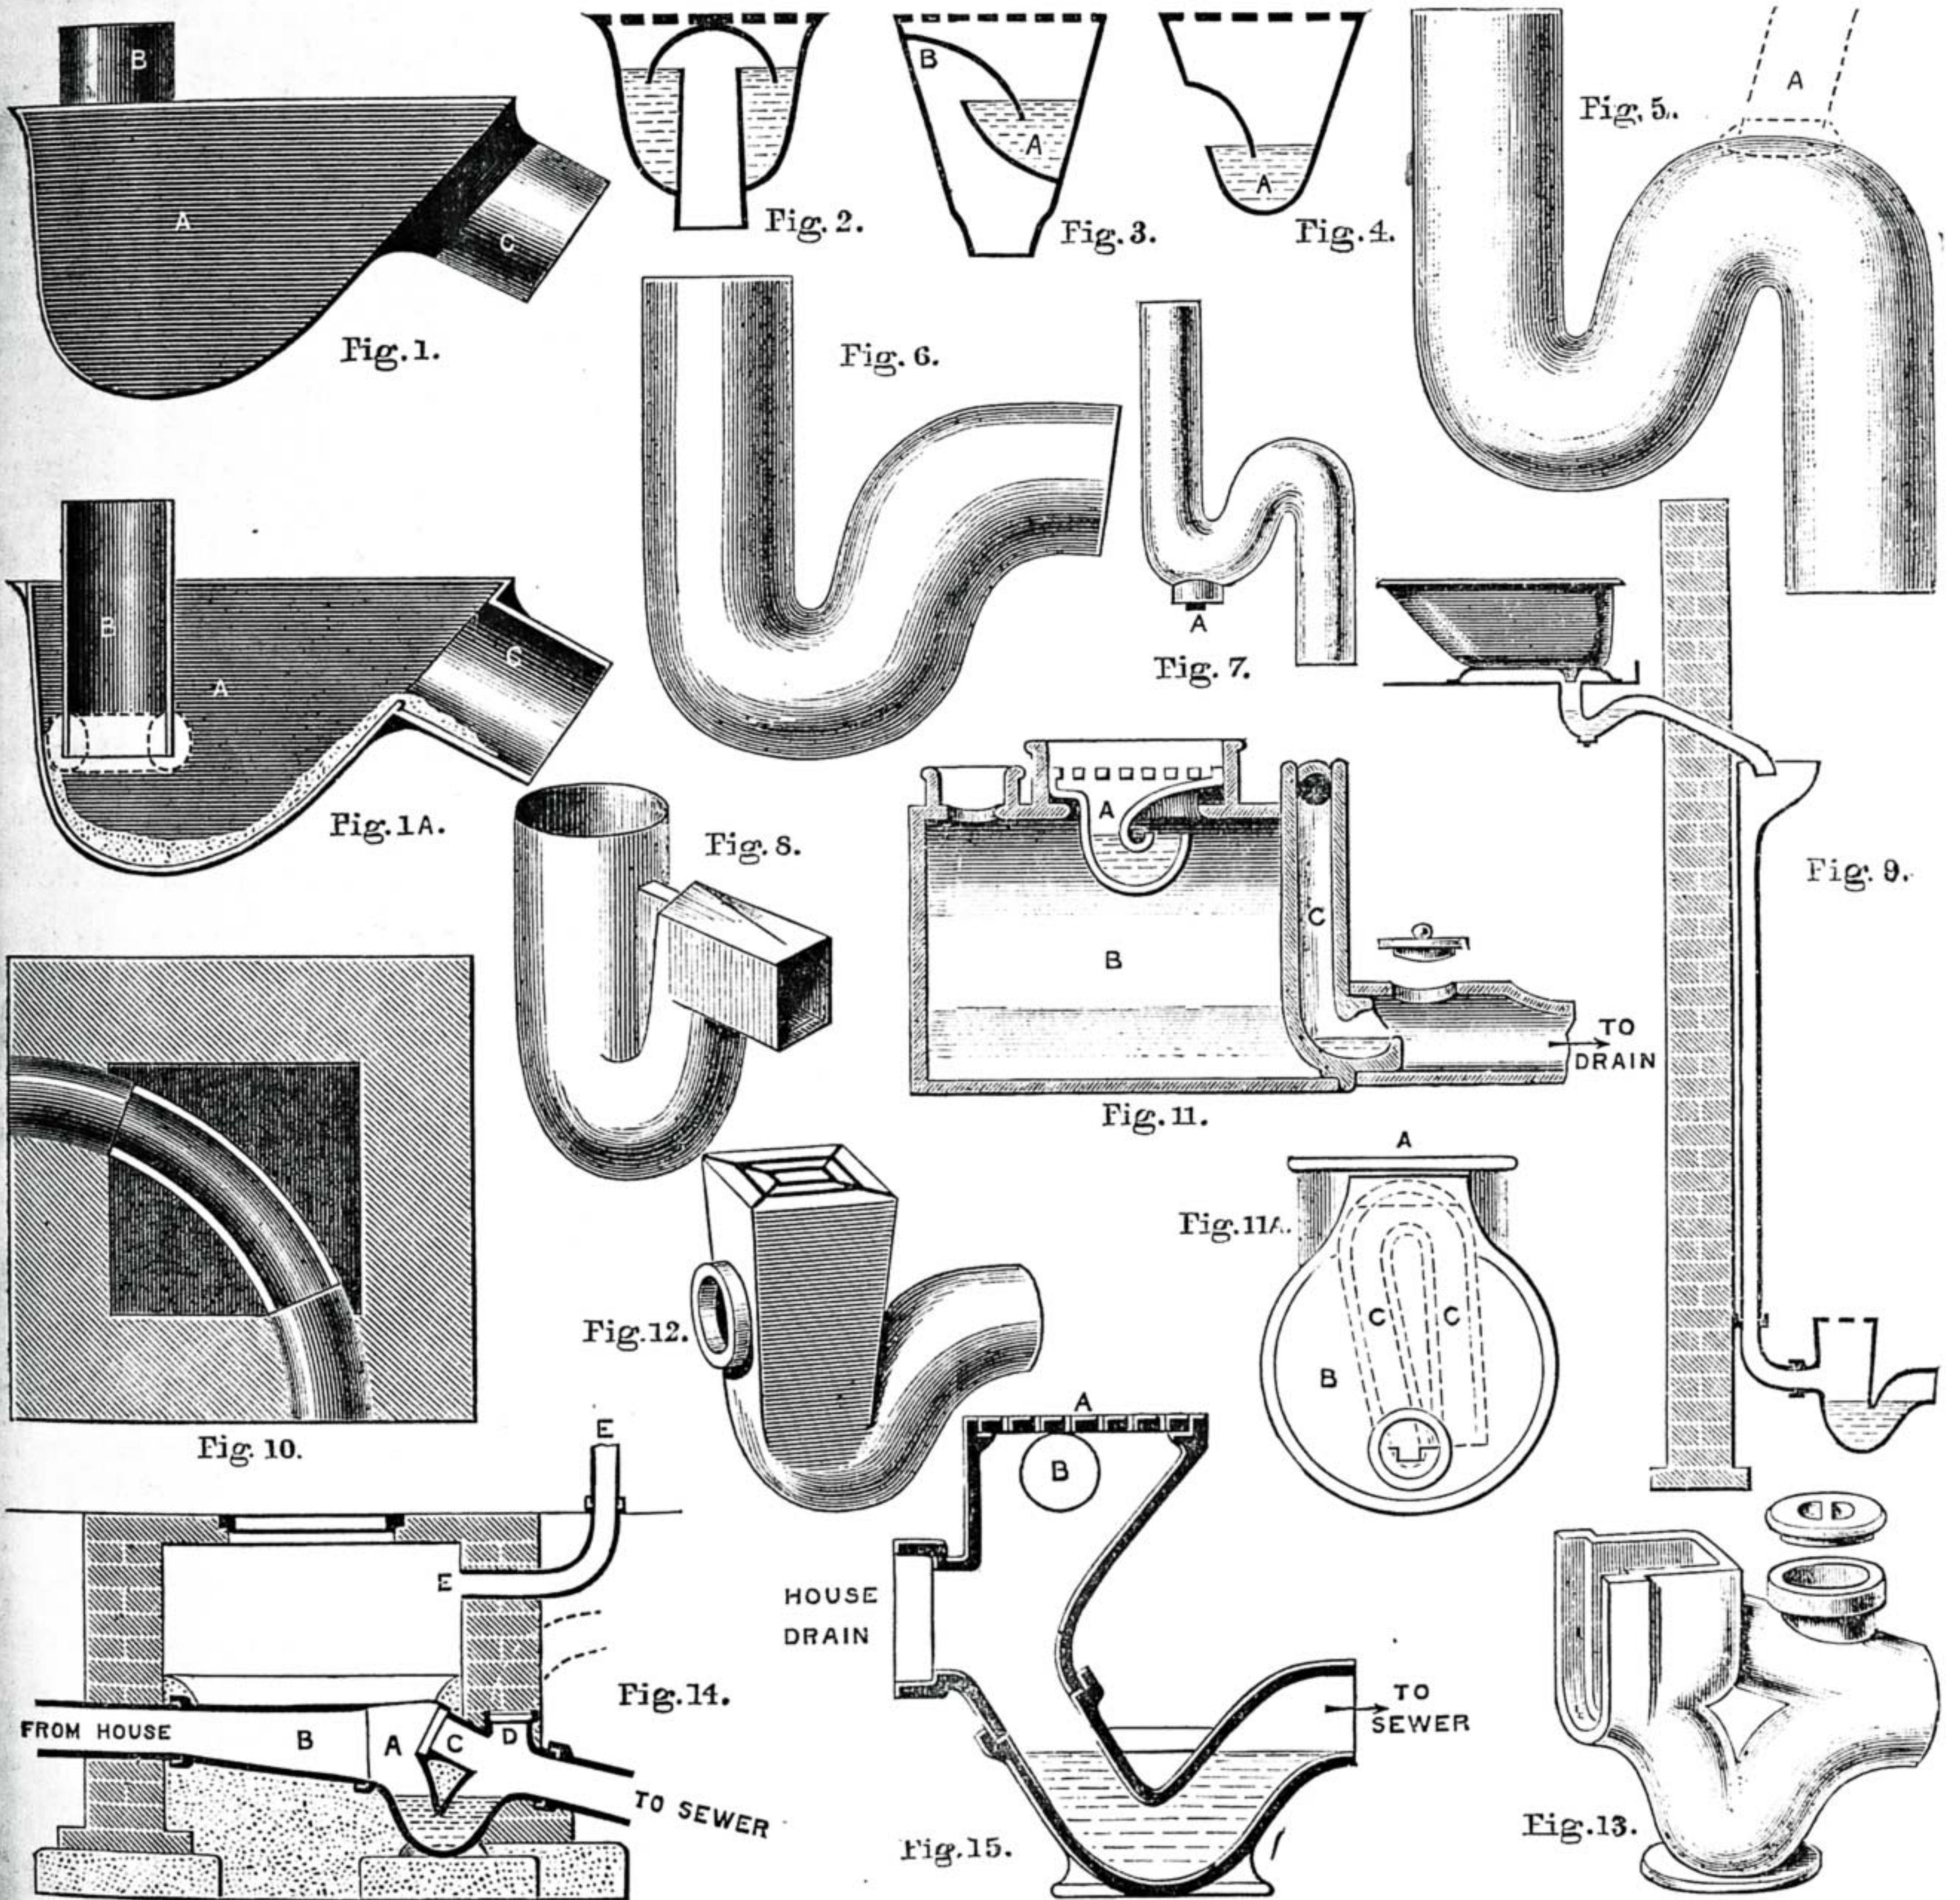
Lead D Trap. Fig. 1 A.—Section of ditto. Fig. 2.—Bell Trap: section. Fig. 3.—Iron Box Trap: section. Fig. 4.—Iron Box Trap, sometimes called D Trap: section. Fig. 5.—Lead S Trap, showing Place for connecting Air-Pipe. Fig. 6.—Lead P Trap. Fig. 7.—Small Lead S Trap, with Cleansing Screw A. Fig. 8.—Hellyer's Anti-D Trap with Square Outgo. Fig. 9.—Diagram showing Manner of conducting Wash from Bath into Drain through Open Gully-Traps. Fig. 10.—Open Channel Bend fixed in Brick Manhole for Inspection. Fig. 11.—Field's Flushing Tank for Drains. Fig. 11 A.—Side Section of ditto. Fig. 12.—Gully-Trap, with Inlet at Back. Fig. 13.—Hellyer's "Drain Sentinel." Fig. 14.—Disconnecting Air Chamber with Hellyer's "Drain Sentinel" Trap and Channel leading to it—A, Trap; B, Channel; C, Inspection Arm; D, Arm for Air Inlet; E, Air-Pipe to Manhole. Fig. 15.—Section of Hellyer's Ventilating Drain Syphon—A, Grating and Inlet for Air; B, Inlet for Air when A is covered.
